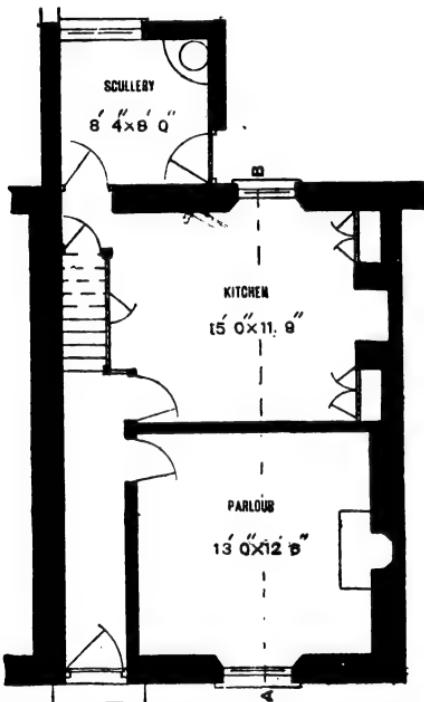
Ground Plan of 17-ft. 1-in. House.
